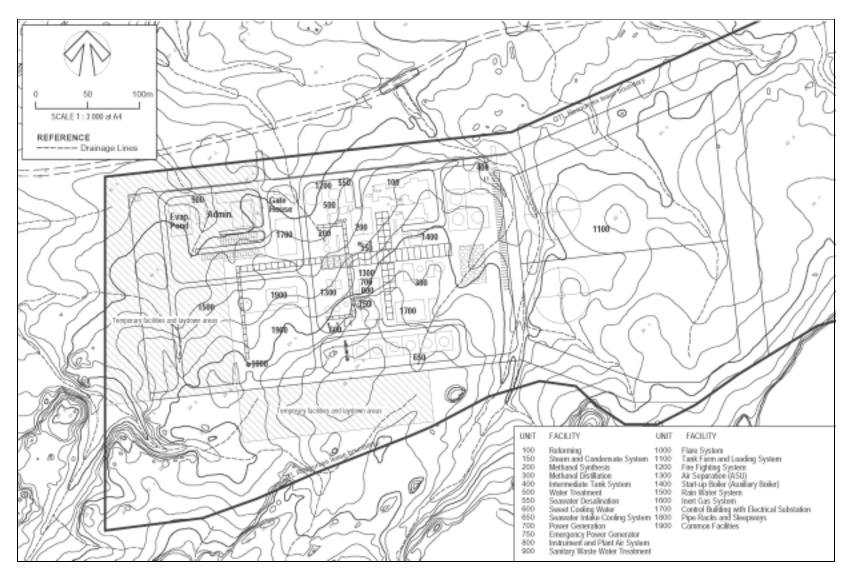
Site layout plan (Source: URS, 2002, amended Figure 4)
